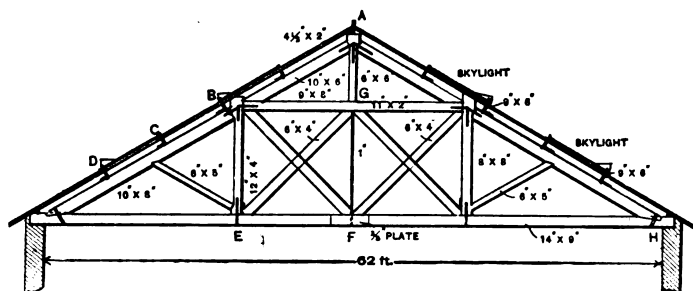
Truss for Roof of 62 Feet Span.—Scale, 1-16 Inch to the Foot.
